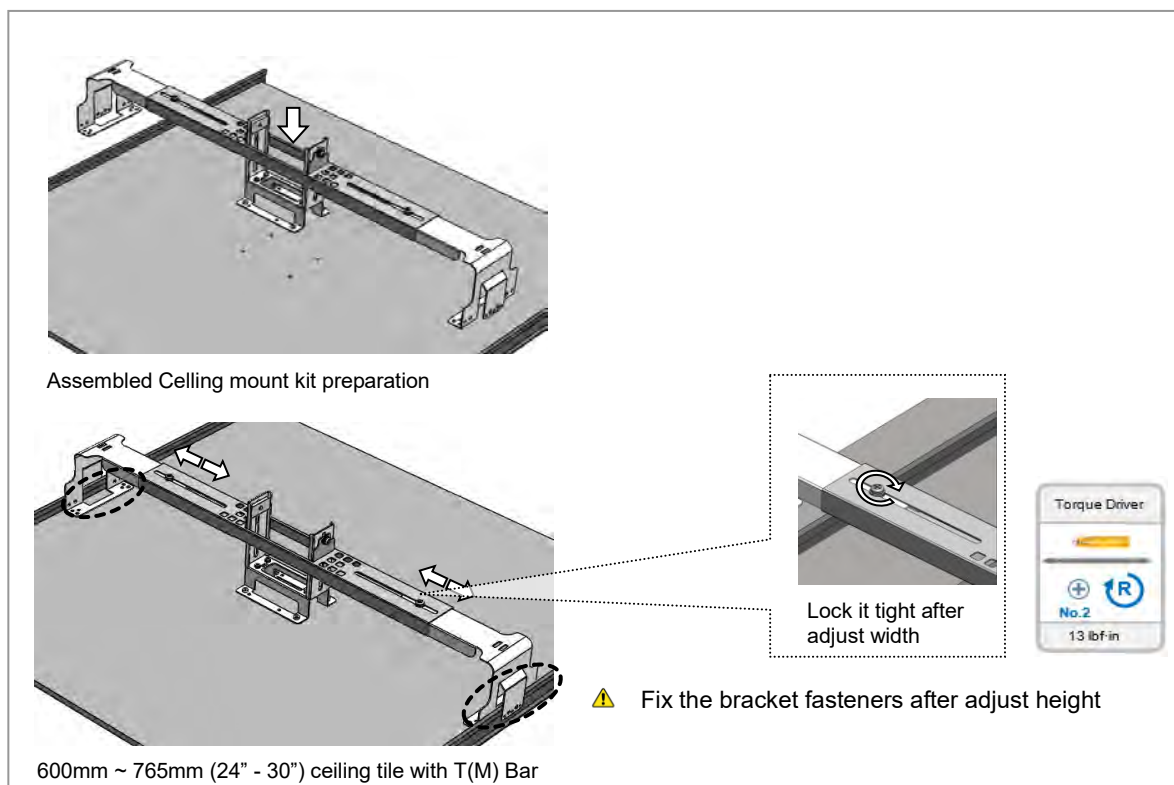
Fixing Fixed Ceiling Mount Bracket Assembly
